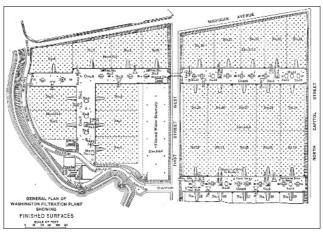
GENERAL PLAN OF WASHINGTON FILTRATION PLANT SHOWING FINISHED SURFACES.
